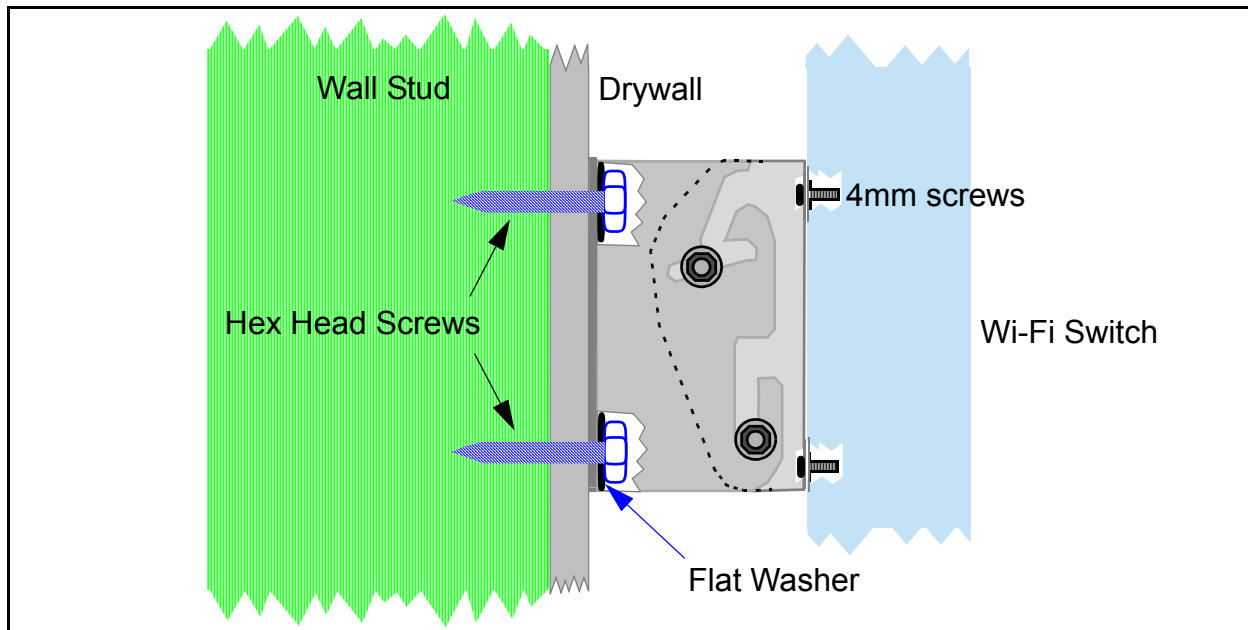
Mounting the Wi-Fi Switch Using the Hex Head Screws
